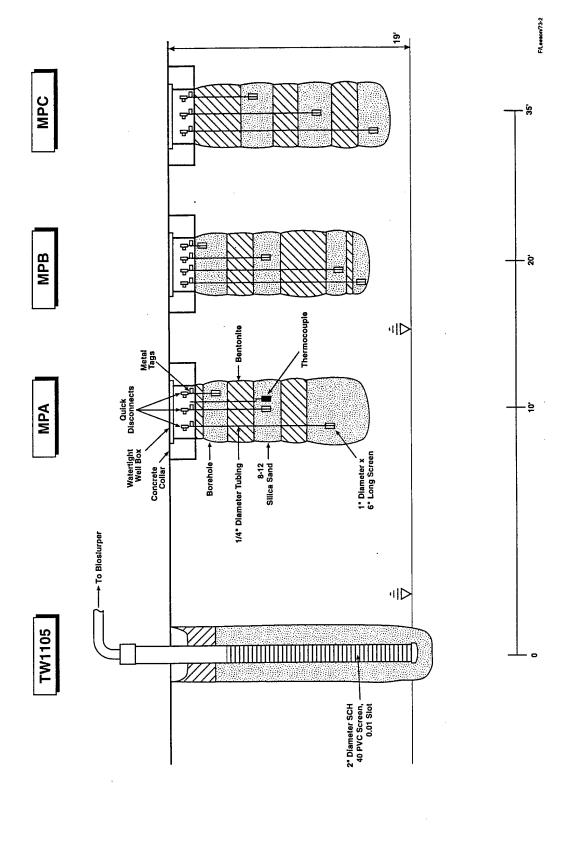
Schematic Diagram Showing Construction Details of Monitoring Well TW1105 and Soil Gas Monitoring Points at Site 160
